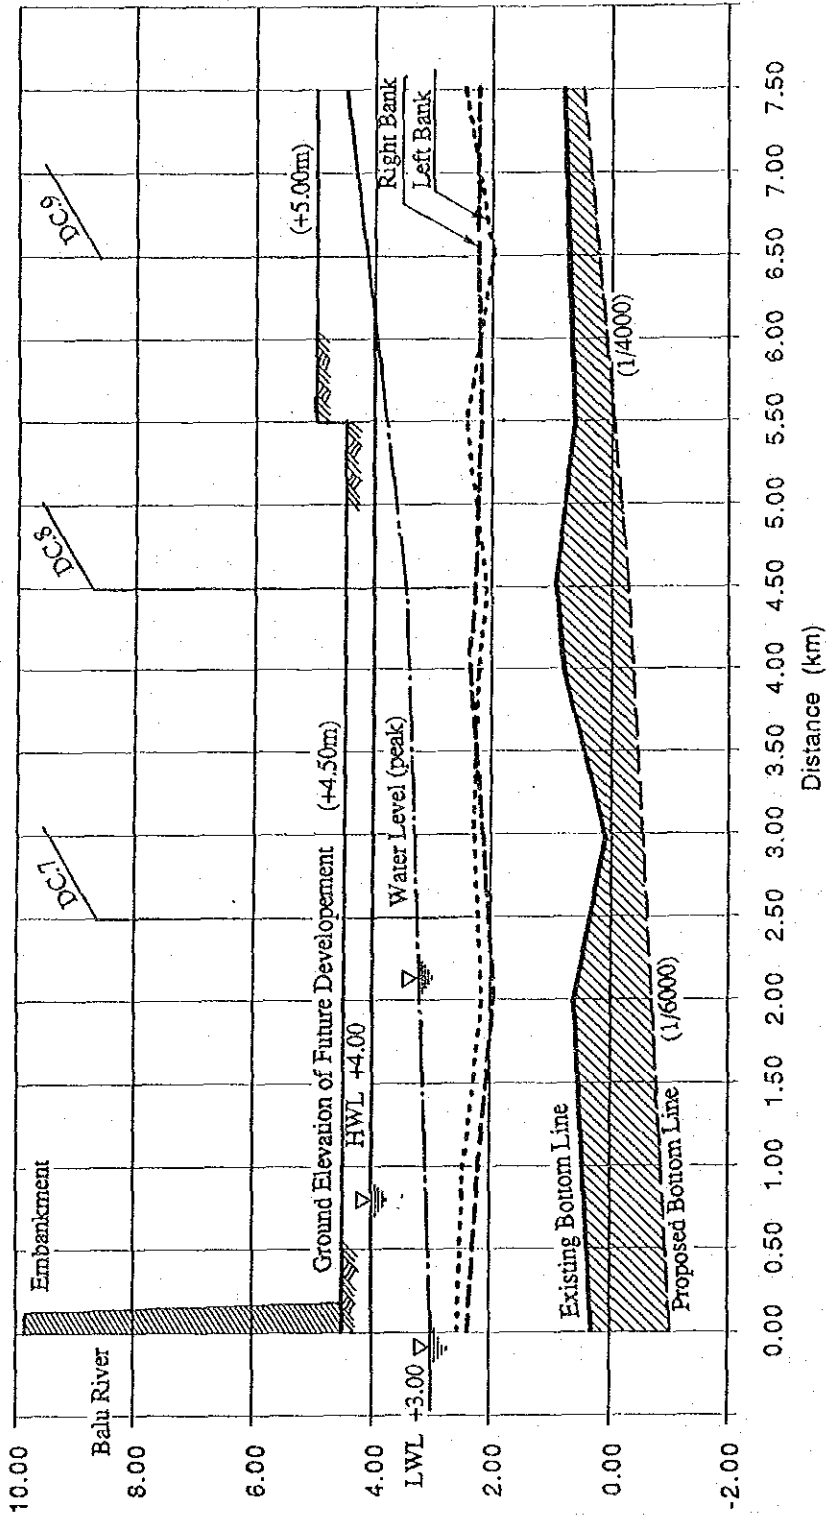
(3) PROPOSED LONGITUDINAL AND CROSS SECTIONS
